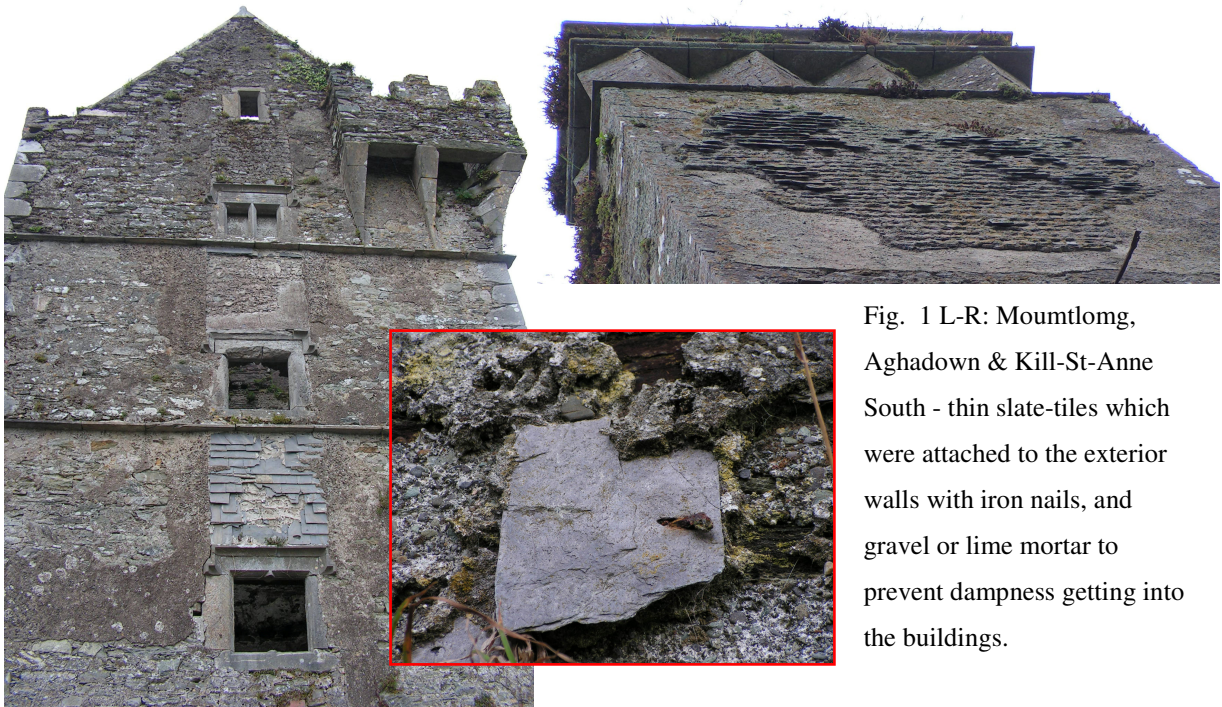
L-R: MOUNTLONG, Aghadown & Kill-St-Anne South - thin slate-tiles which were attached to the exterior walls with iron nails, and gravel or lime mortar to prevent dampness getting into the buildings.
